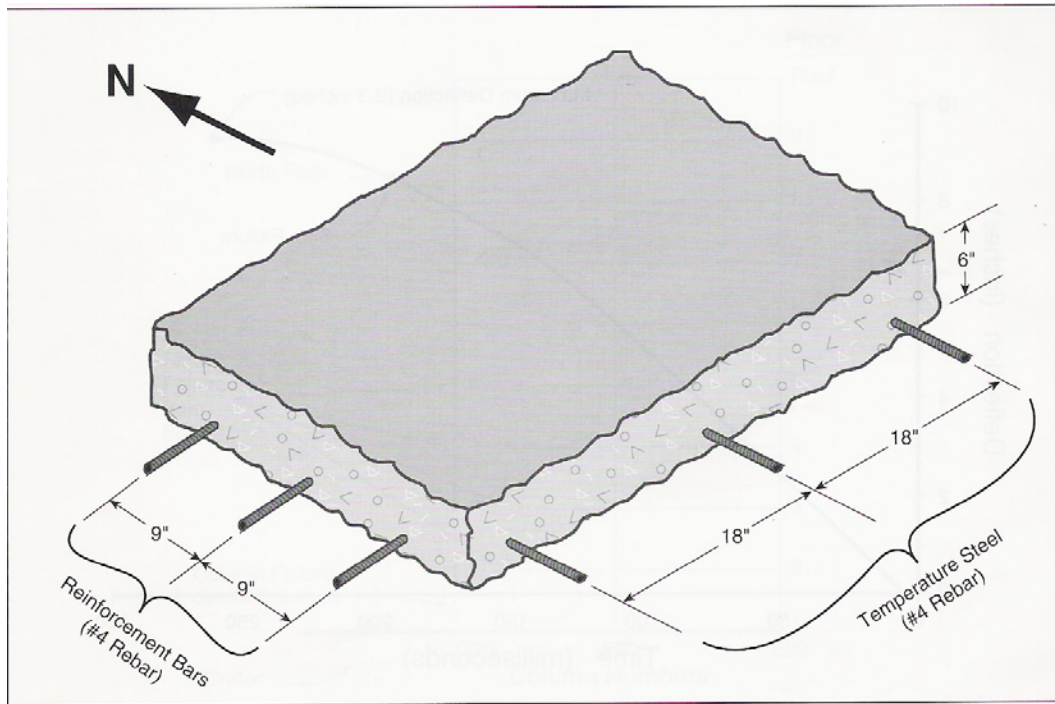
Floor Slab Reinforcement (FEMA 1996)
